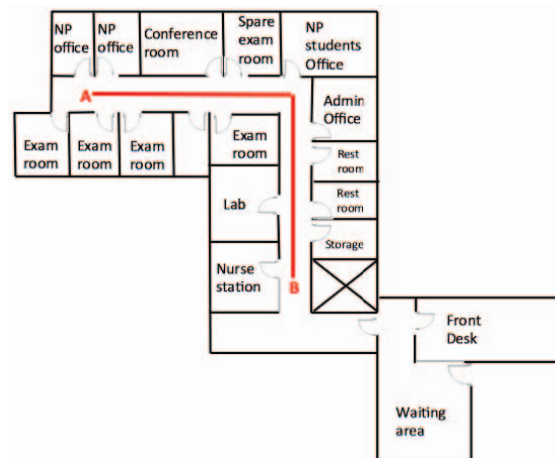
Floor plan of the study site, showing walking path between exam rooms (A) and nurse station (B).
